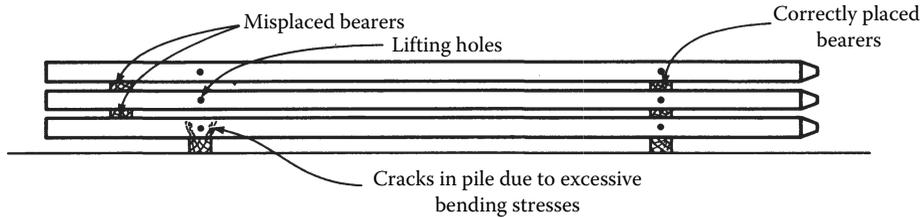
Misplaced packing in stacks of precast concrete piles.
